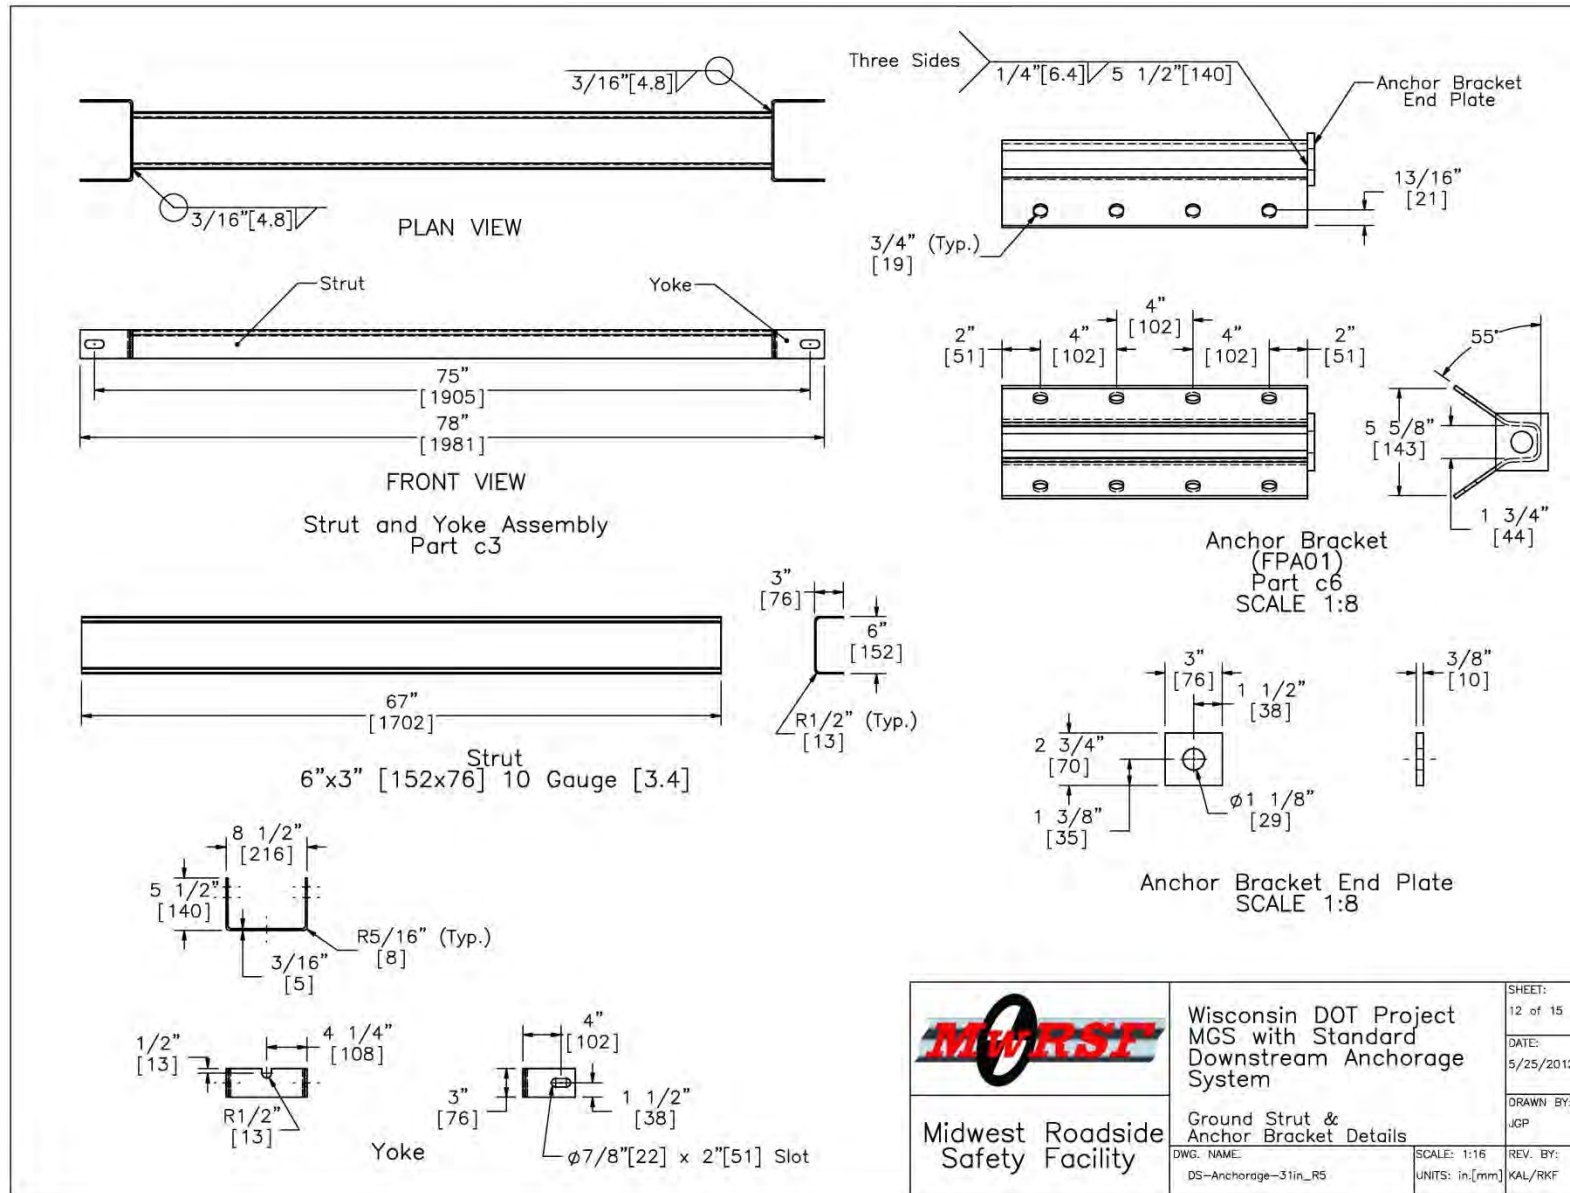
Ground Strut and Anchor Bracket Details, Test No. WIDA-1
